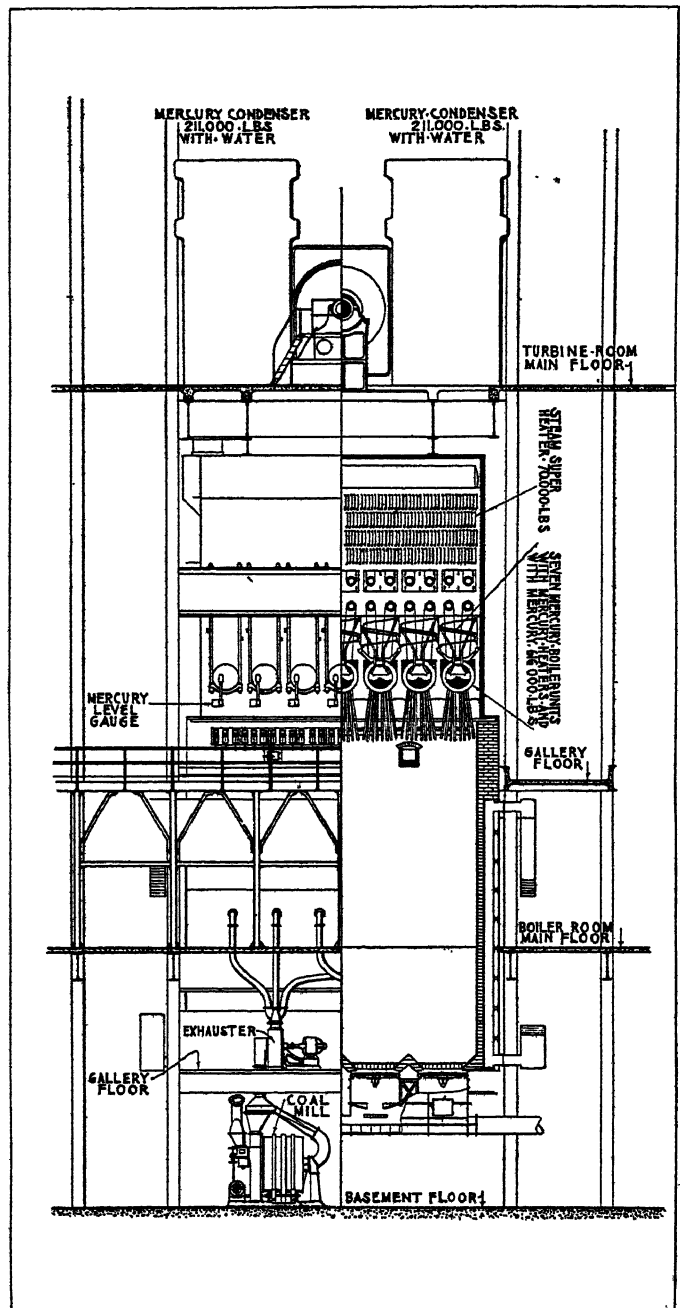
ARRANGEMENT FOR MERCURY-VAPOUR BOILER AND TURBINE EQUIPMENT, SIDE ELEVATION
